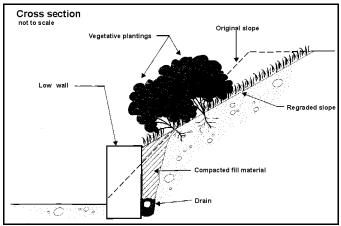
A low wall with plantings established on the slope above (USDA-SCS, 1992).
